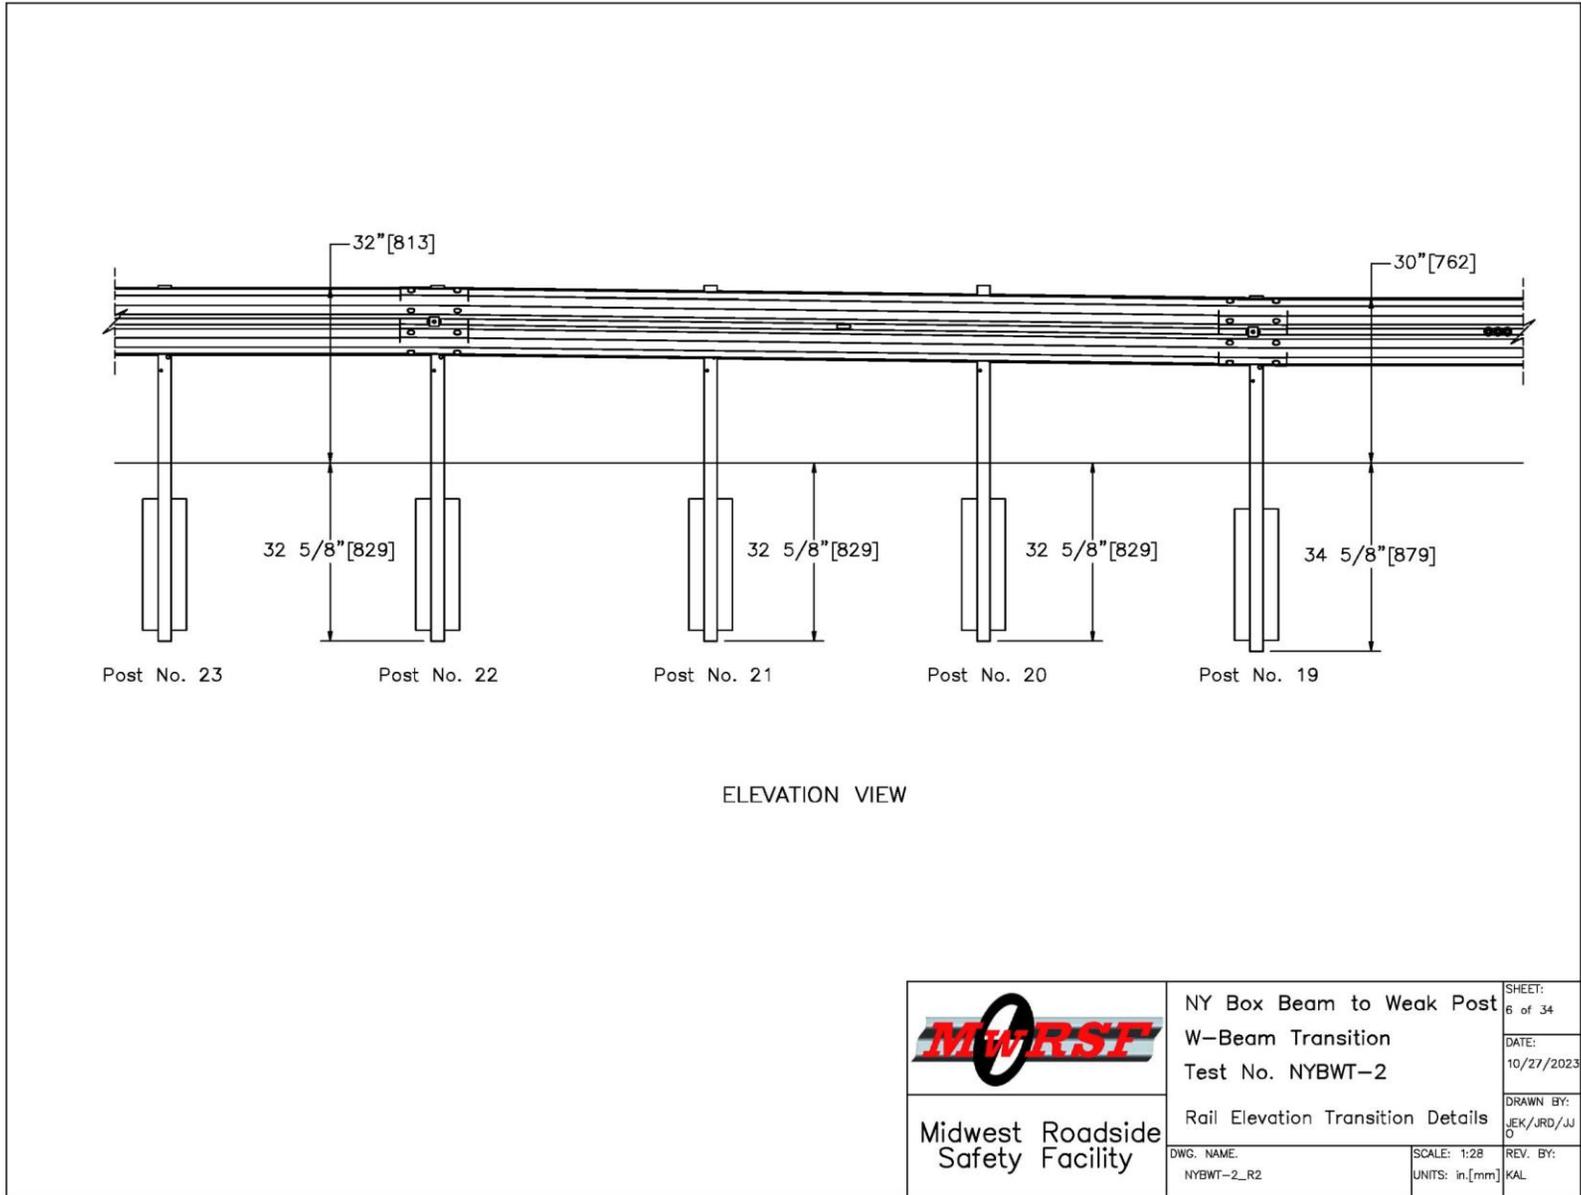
Rail Elevation Transition Details, Test No. NYBWT-2
